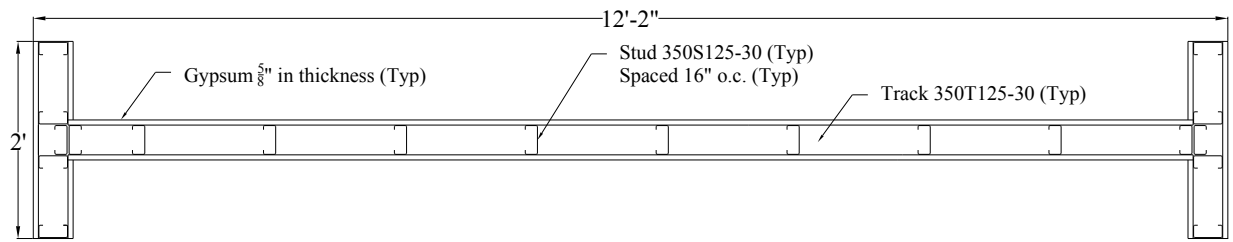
Detail Geometry Institutional Gypsum Partition Wall
